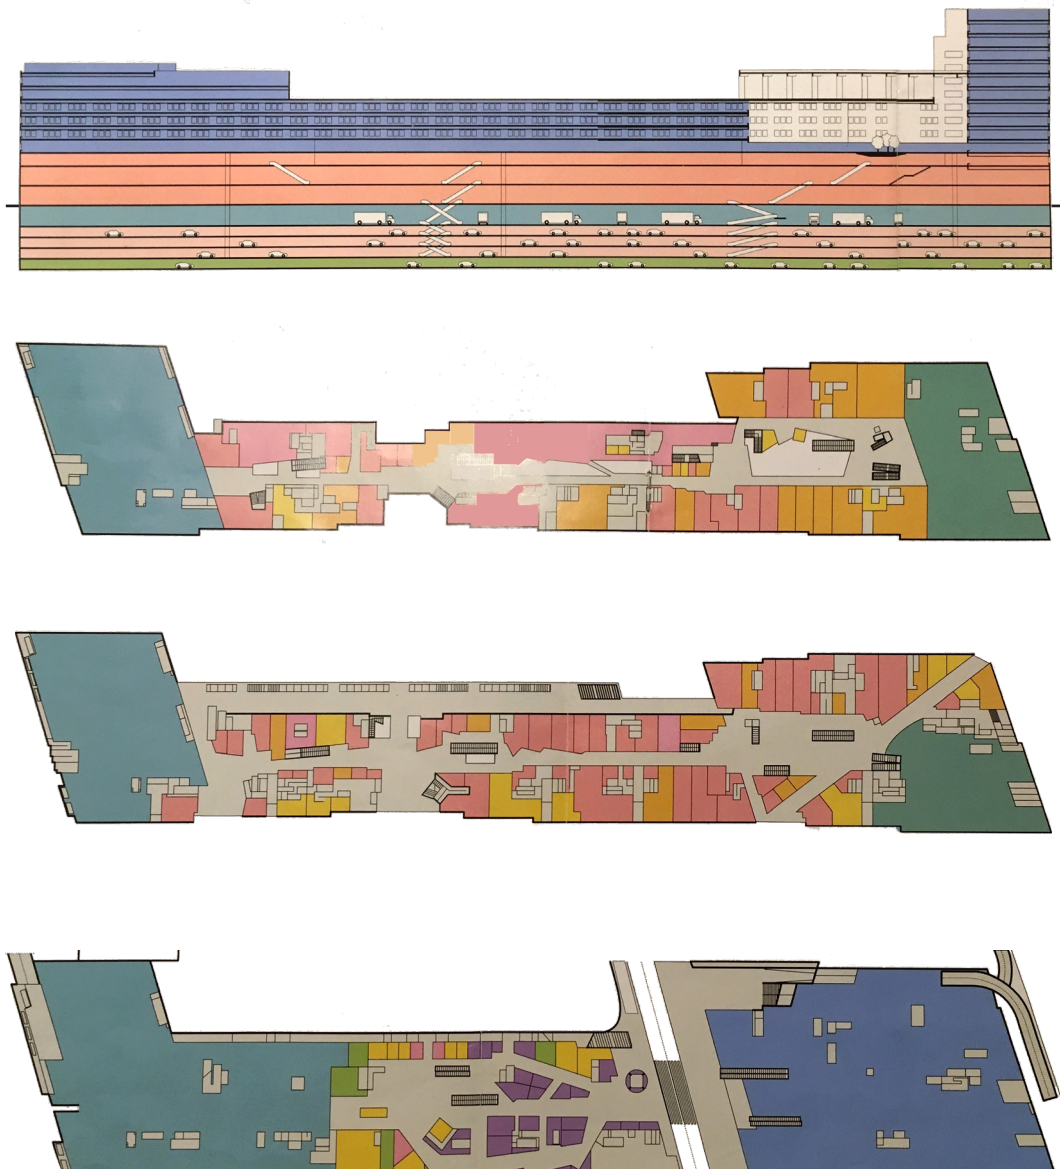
Longitudinal section, first floor, ground floor and first underground floor of the L'illa Diagonal commercial center [2003]
